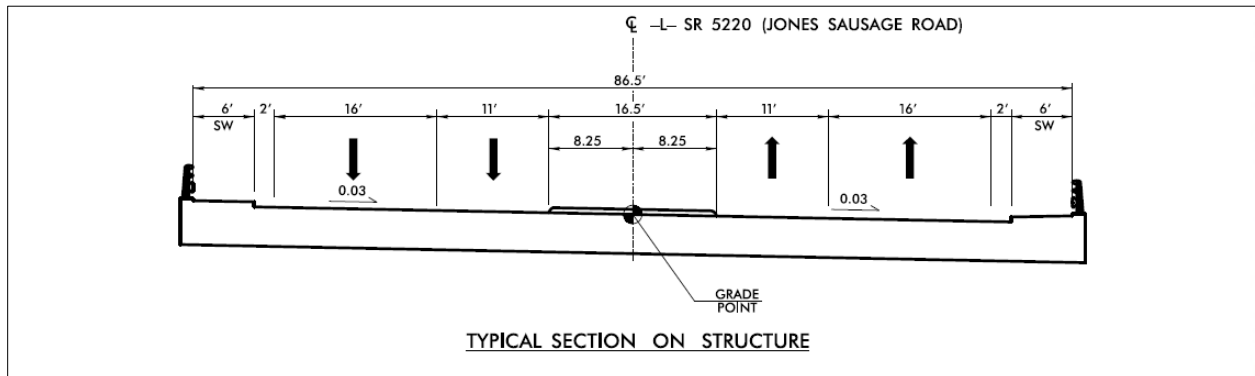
Jones Sausage Road Feasibility Study Structure Typical Section without the School Access Road
